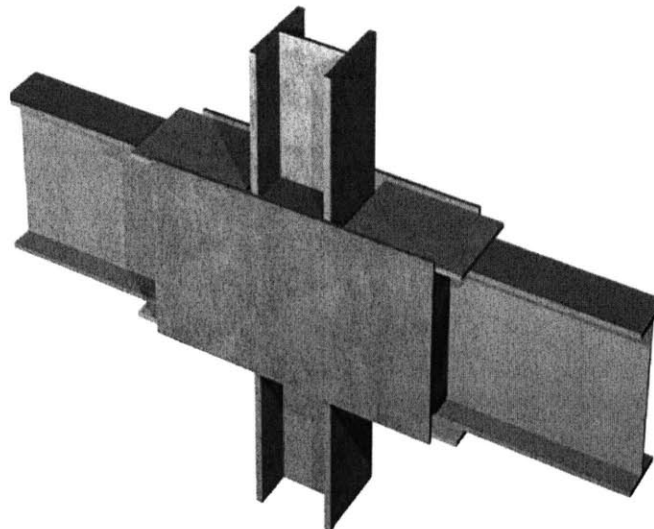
SidePlate™ Connection Detail (Houghton & Karns)
